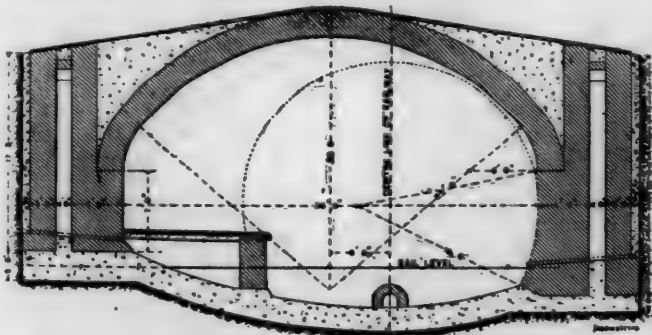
TRANSVERSE SECTION OF COVERED WAY No. 7, BRIDGTON SECTION.
